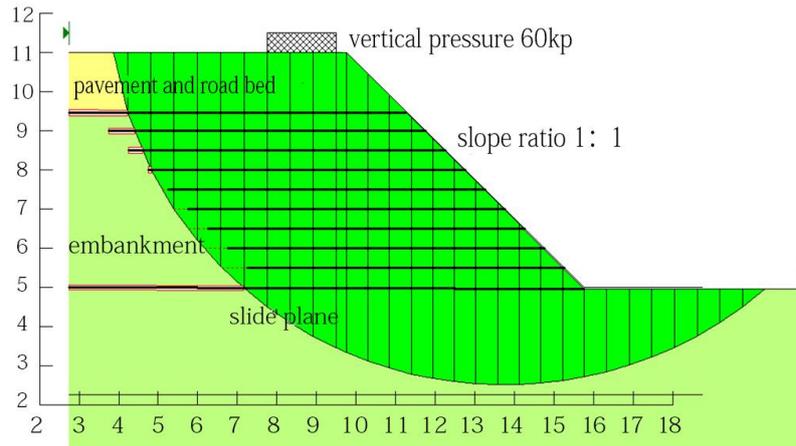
The Slide Plane Diagram of Geotechnical Grille Reinforced Embankment
